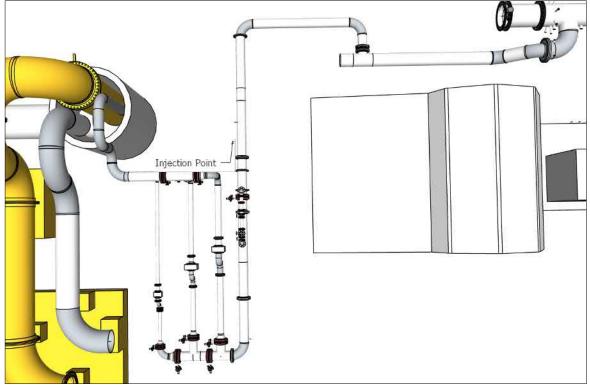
Plan View of the Inlet and Outlet Piping to the ATG WF UV Reactors
